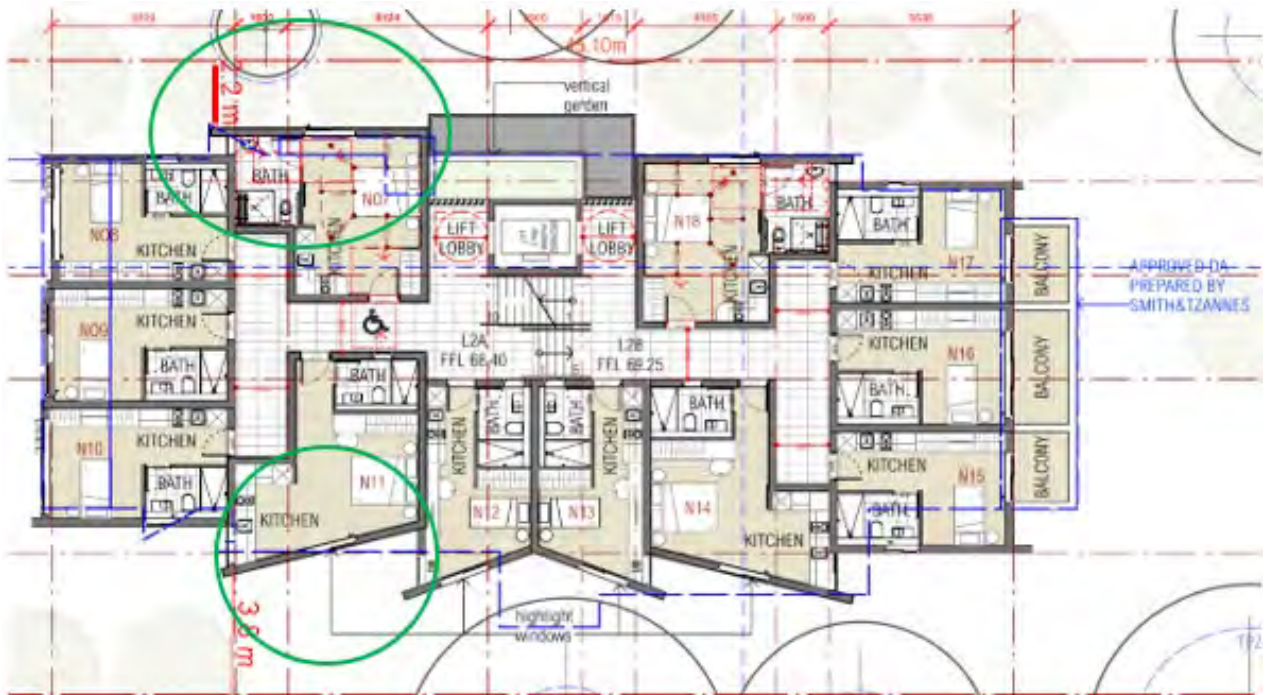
Amended plans illustrating the rear side section reduced along the northern elevation but increased on the south elevation. The areas where the setback has been modified is circled.
